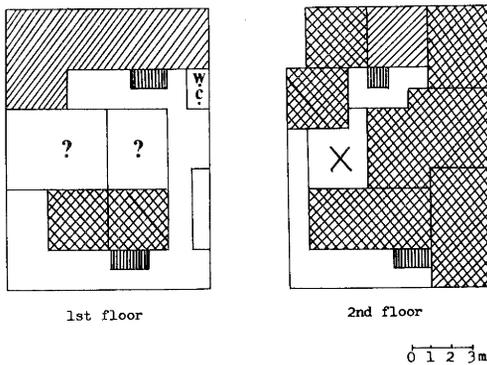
Distribution of the rooms infested with common bed bugs in Building J.
